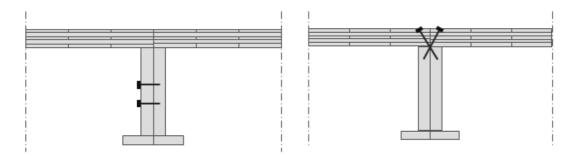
Two different ways of connecting two floor elements for shear resistance in the longitudinal joint.
